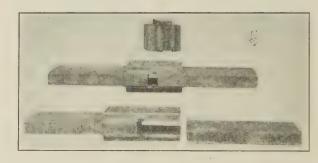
Tests on Welded Structural Steel Showing Compression and Tension Specimens after Failure
